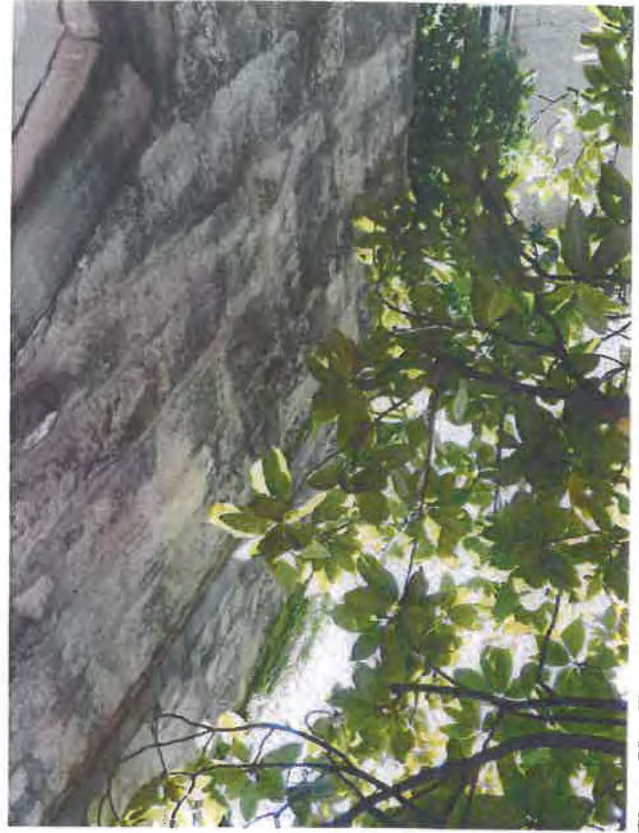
Tree limbs should be pruned so there is no contact with building walls.
